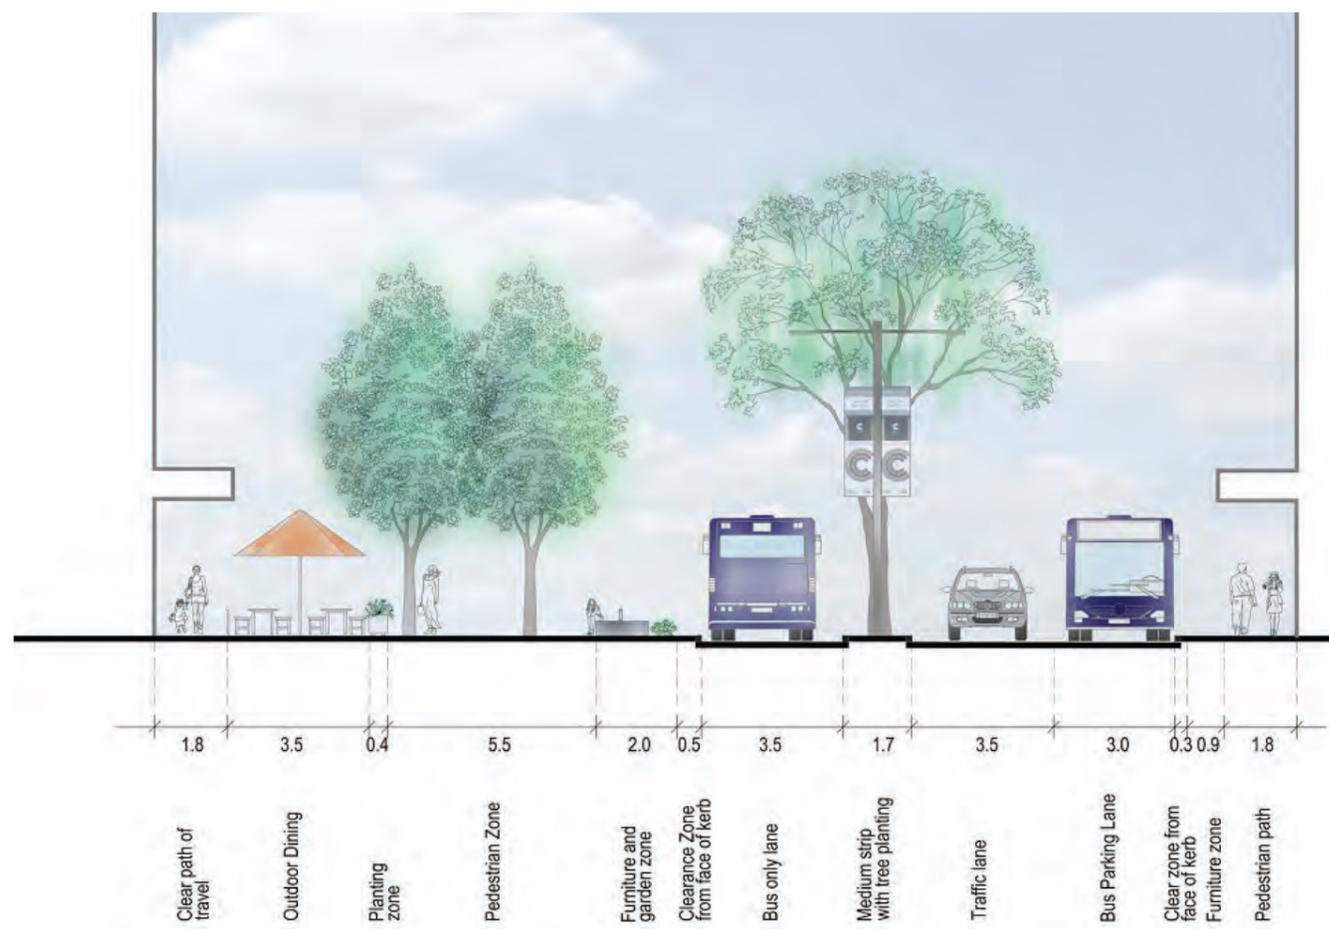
Dunmore Street Section Through Plaza - Looking West
